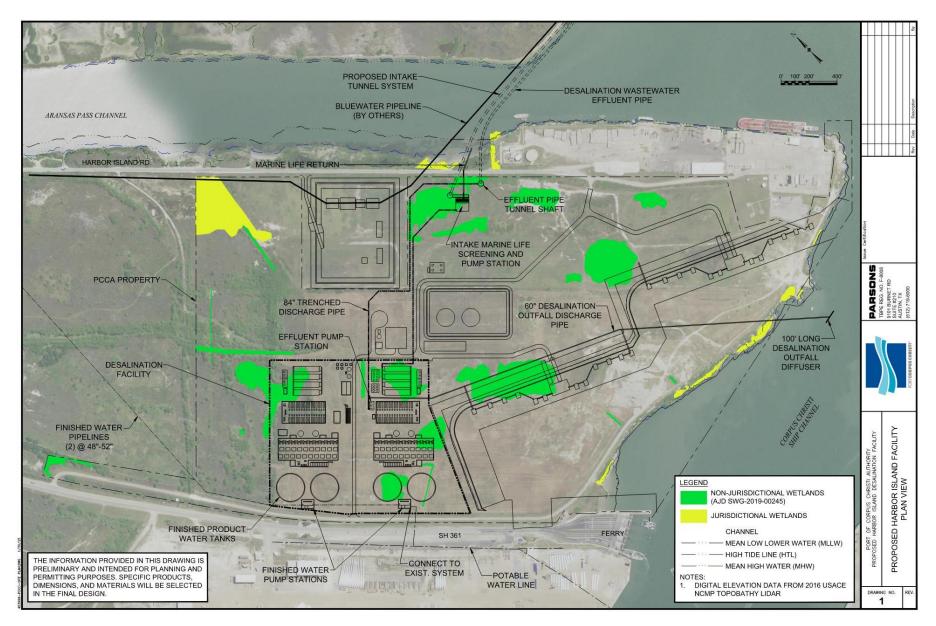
Proposed Facility Layout with Alignment of the Trenched Section of the Effluent Discharge Pipe on Harbor Island
